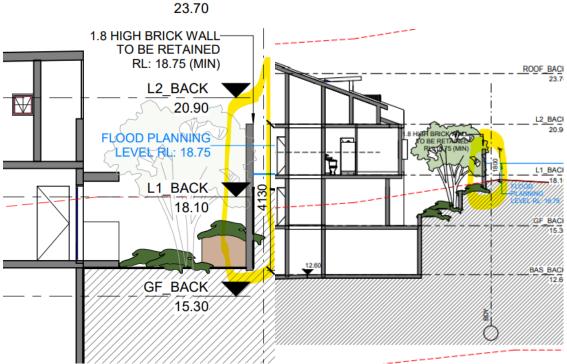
Sections of rear buildings showing level differences and walls that provide screening.
